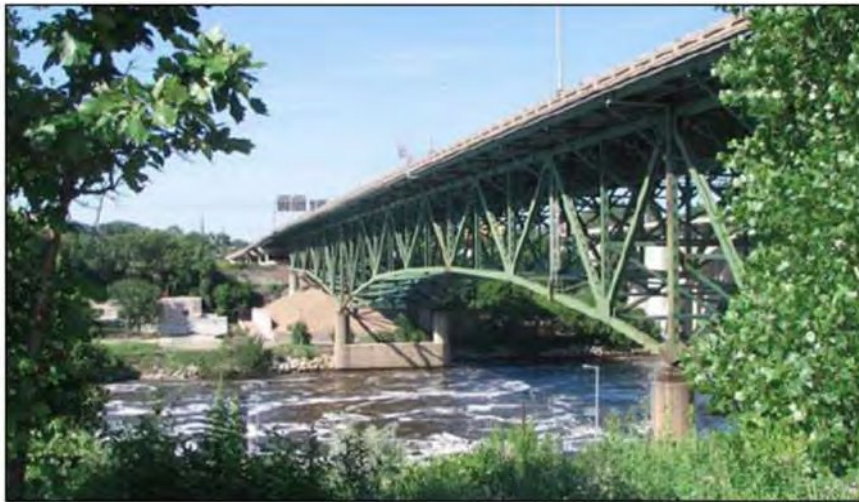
Center span of I-35W Bridge prior to the accident, looking northeast. (Source: NTSB.)
